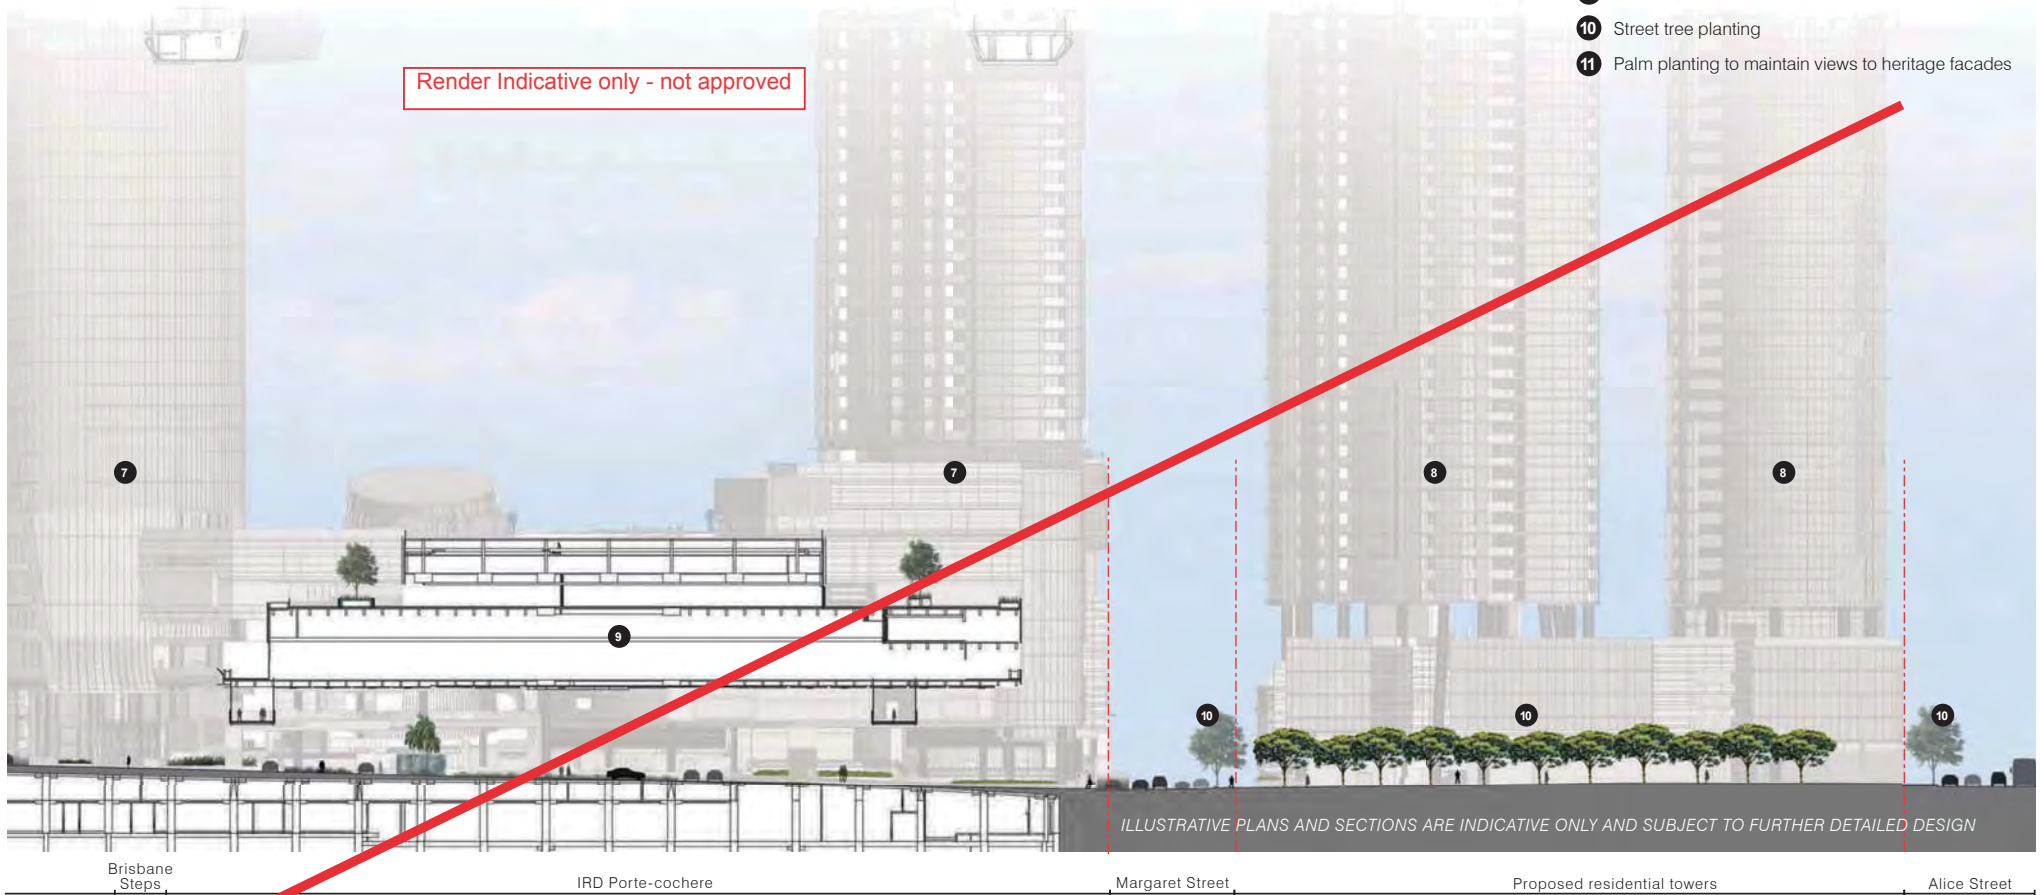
William Street North Sectional Elevation (Not to scale)
